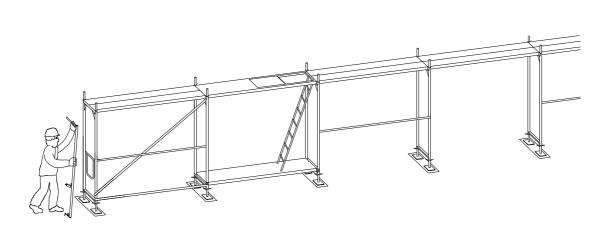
Preparing the guardrail post with advanced end guardrail
